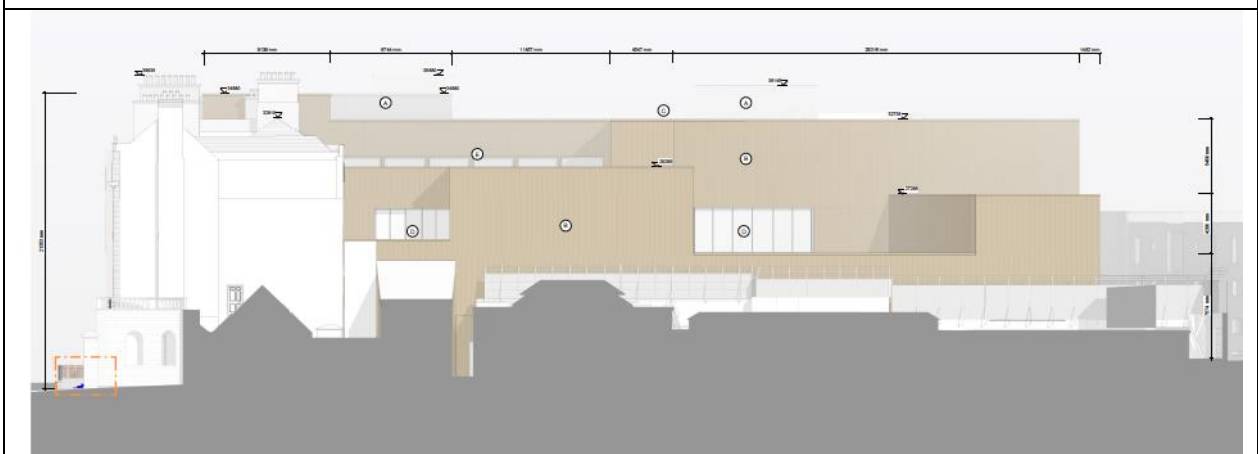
East Elevation proposed from Section 146B Planning Drawings for Parnell Library. Hugh Lane Gallery profile in the grey hatch.
